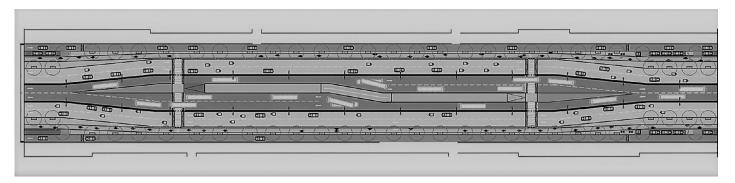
Plan of a typical bus rapid transit configuration without passing lanes (24-metre street)
